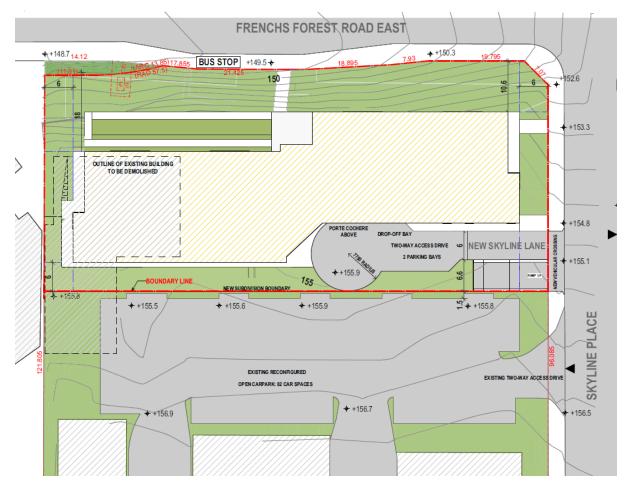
Proposed/Existing Buildings and Subdivision Layout (Source: PA Studio)
